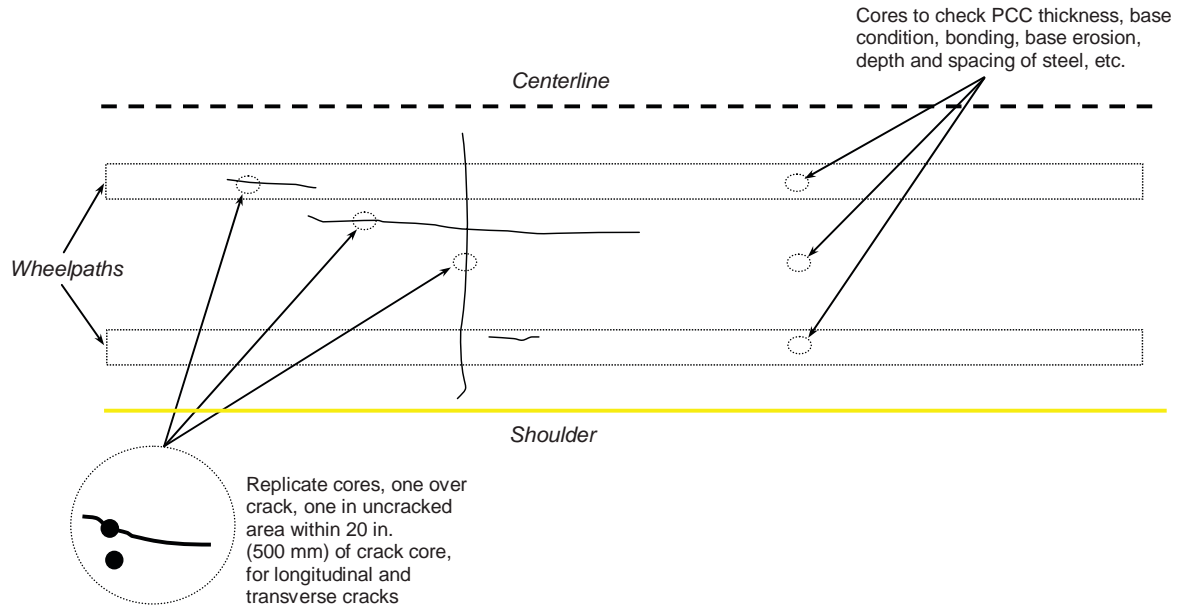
Examples of core locations for continuously reinforced concrete sections.
